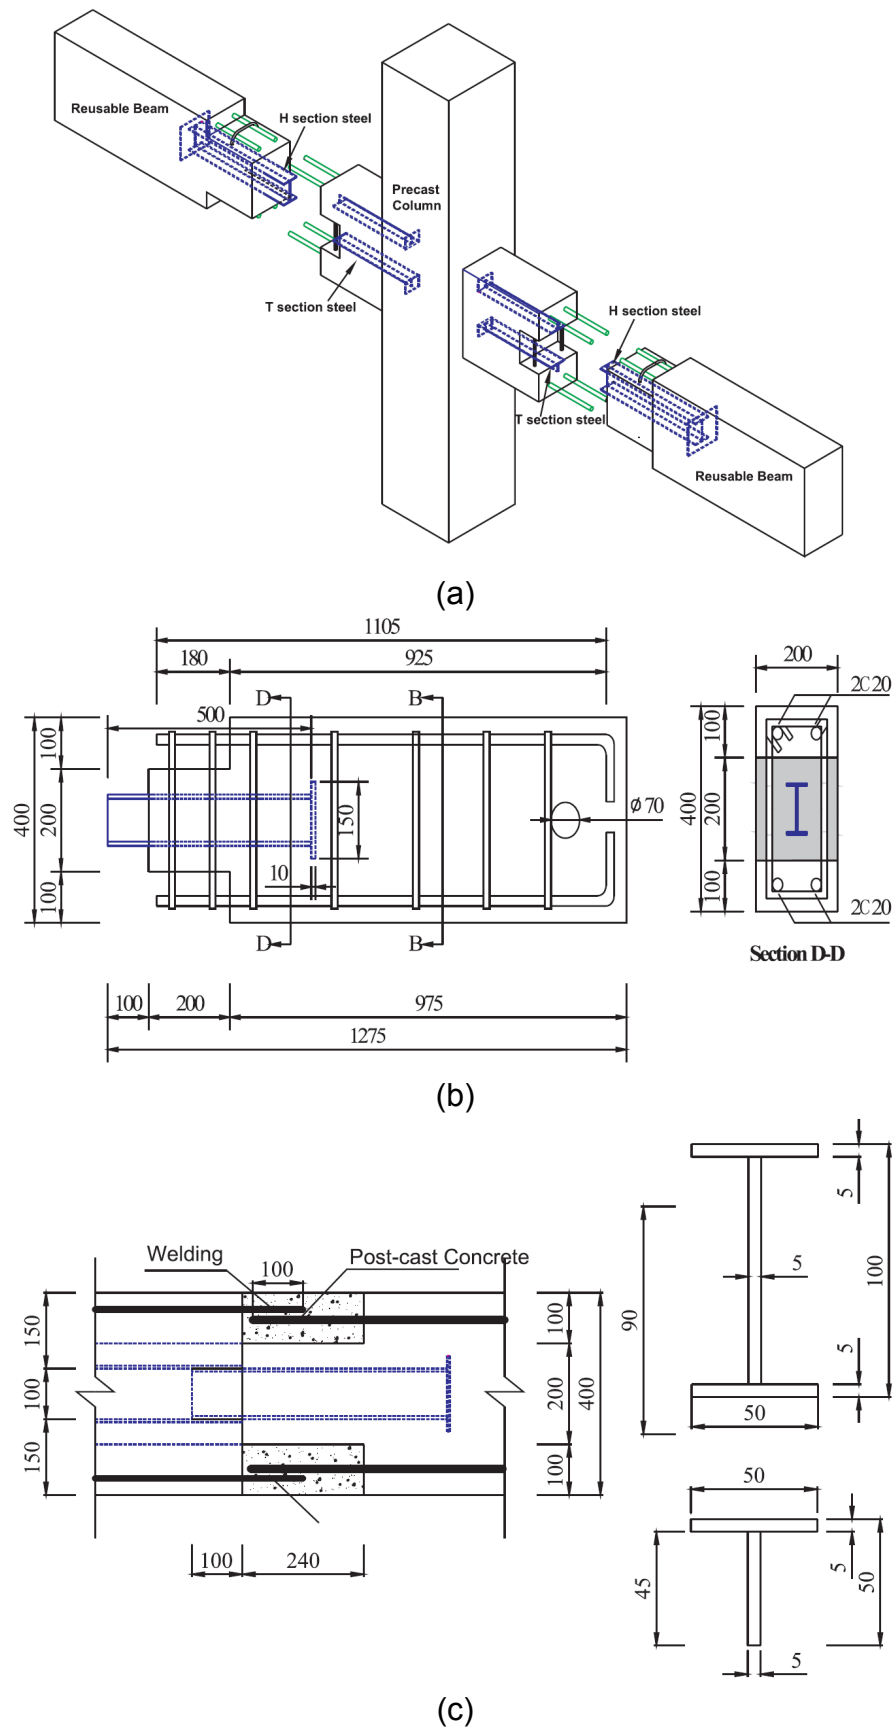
(a) Specimen, (b) section details and (c) connection details of proposed DfD concrete connection tested [46]
